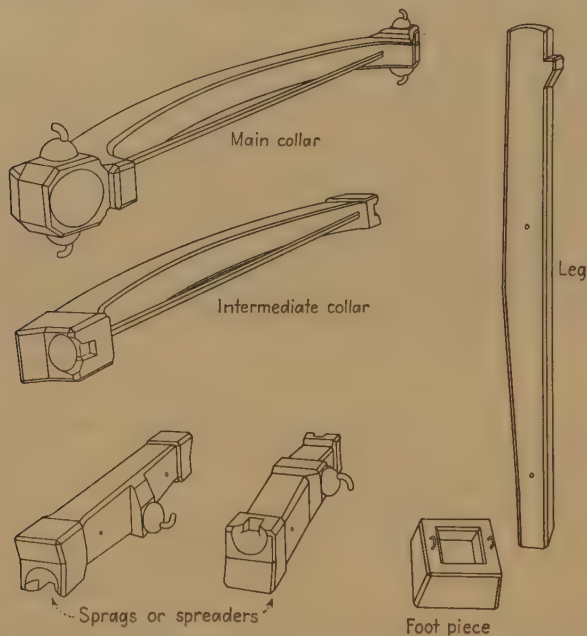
INDIVIDUAL MEMBERS OF PRECAST CONCRETE SETS, MUSPRATT SYSTEM.
